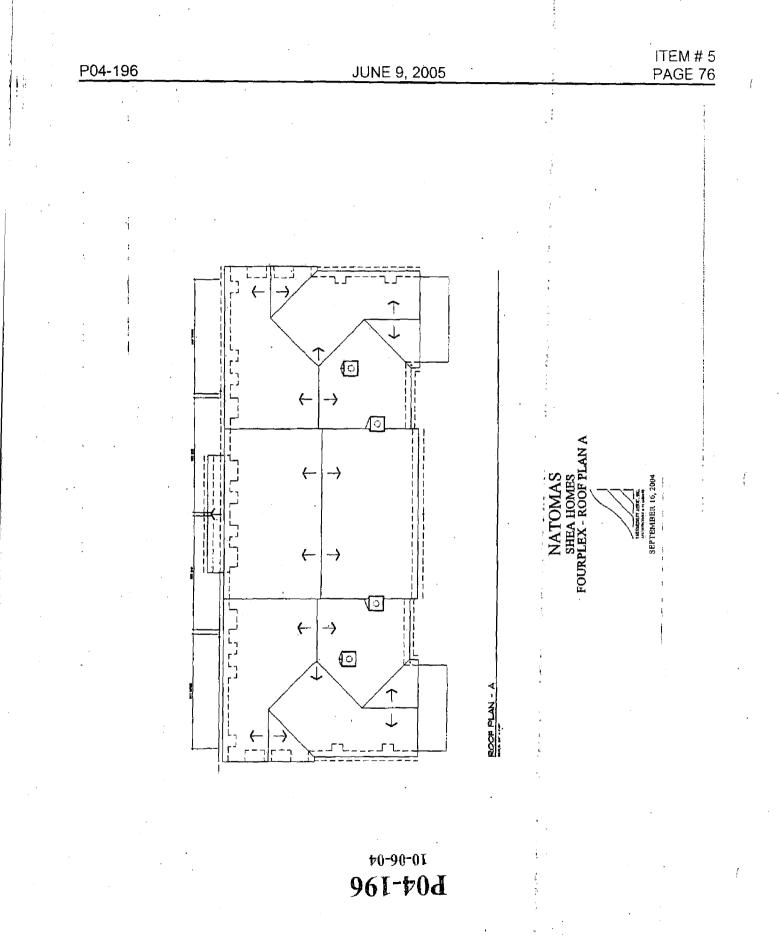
H - Terraces - Fourplex - Floor Plans, Roof Plans, and Elevations
